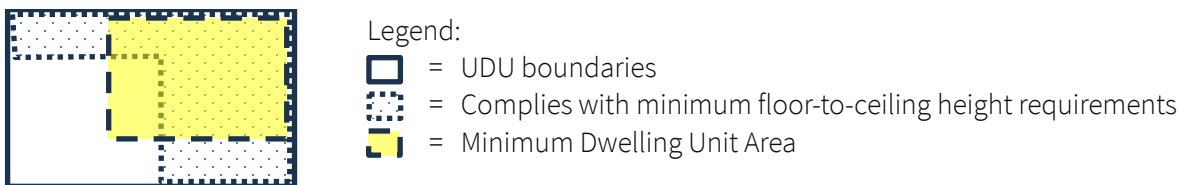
Figure B: Example UDU meeting minimum area, but not meeting floor-to-ceiling height
